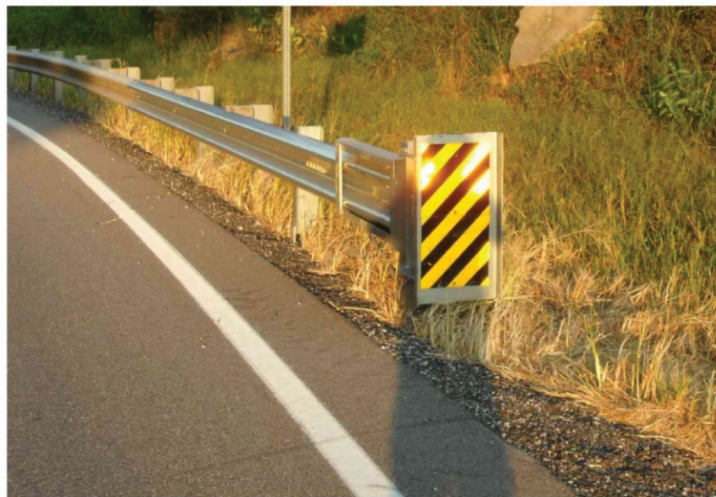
SR56 EB; South side; Around NE Dubois; Repaired Crash Attenuator; Photo Facing East
